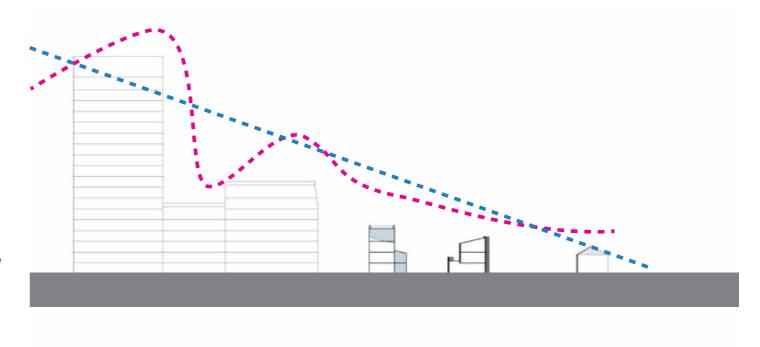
Phelp Gardens Elevation - Proposed Massing
